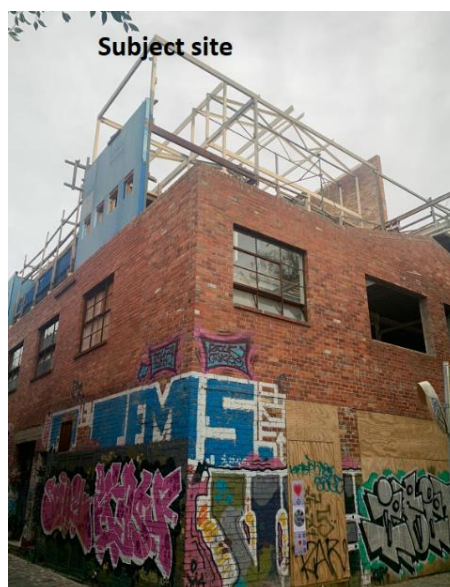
Subject Site as viewed from the north-east, at the intersecting laneways and south of the Garryowen Park.
